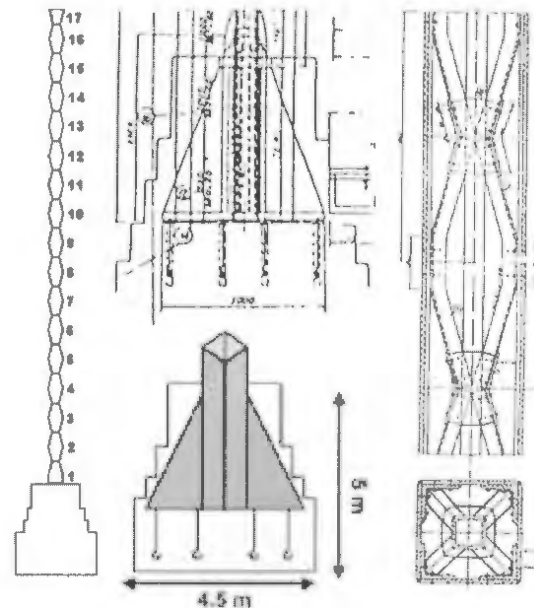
Foundation of the column: (a) concrete block; (b) connection between the base of the spine and the foundation by anchor bolts; (c) trellis made up of sections laid in a cross.
